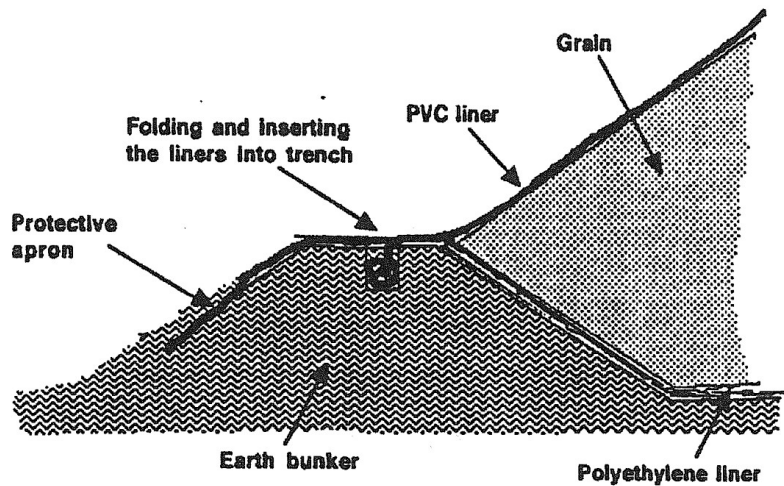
Section of earth bank to show folded liners in trench and the protective apron.
